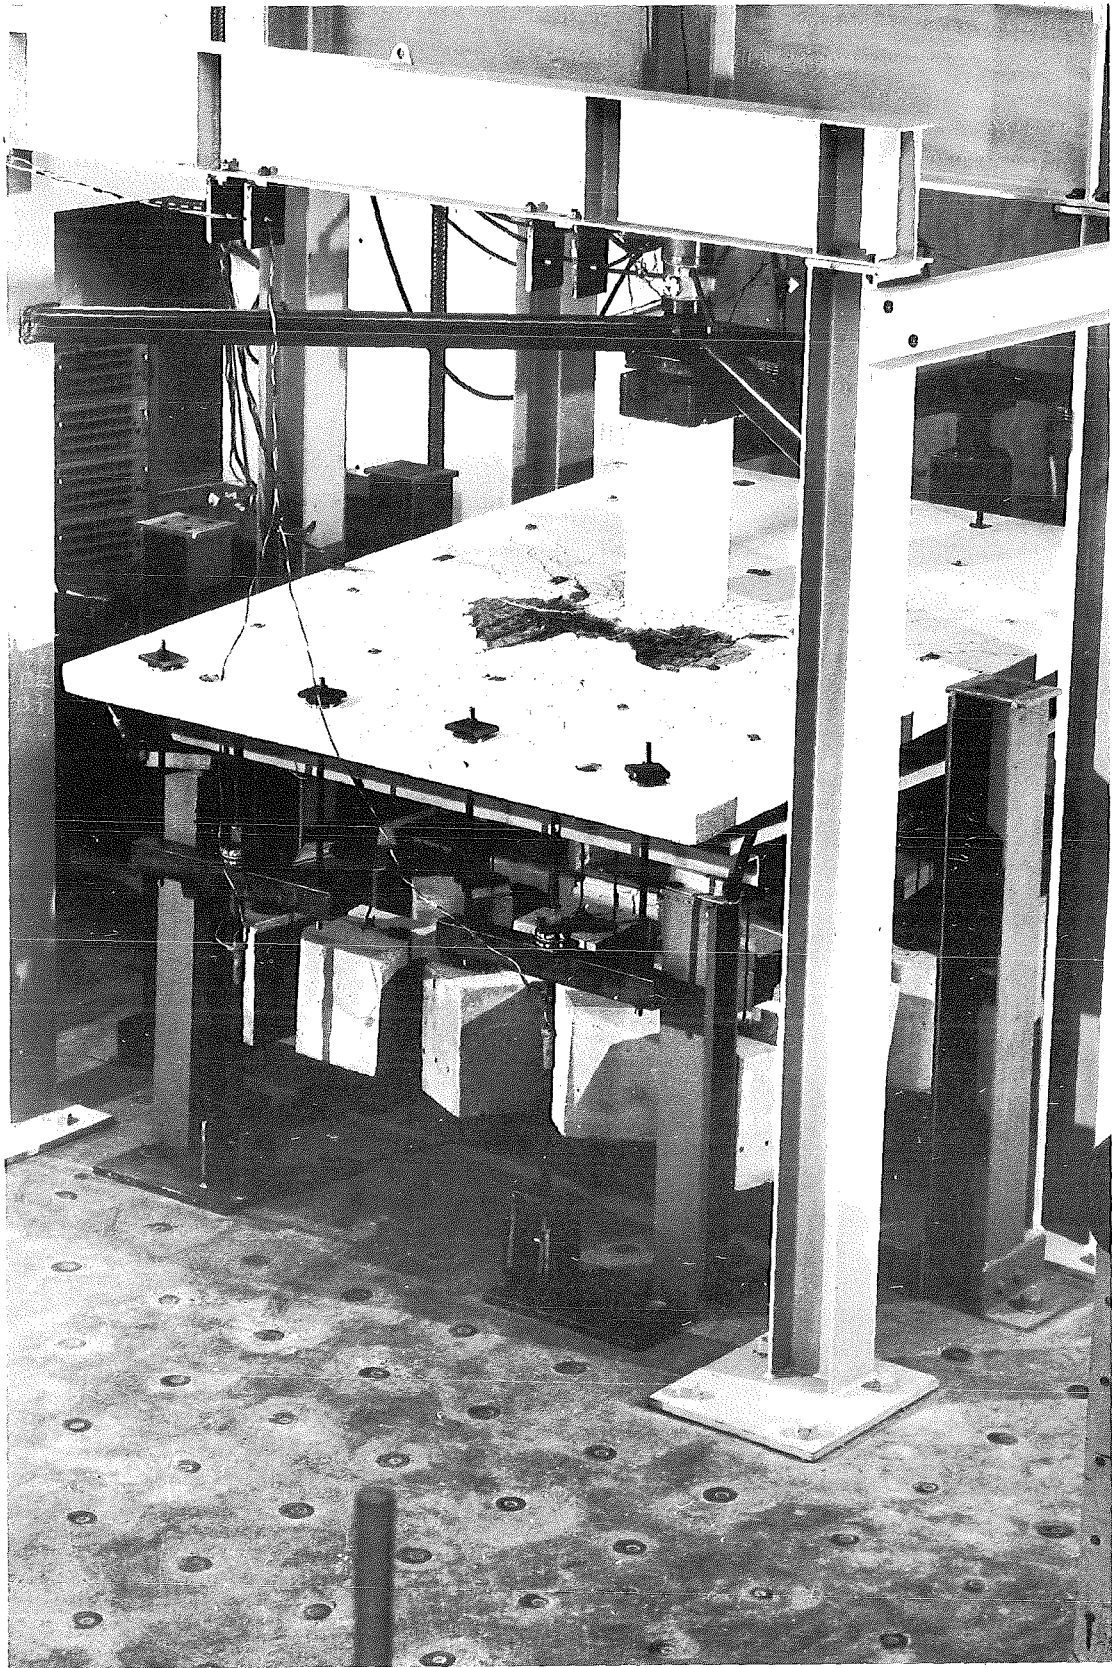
SLAB-COLUMN SPECIMEN IN THE TEST RIG
